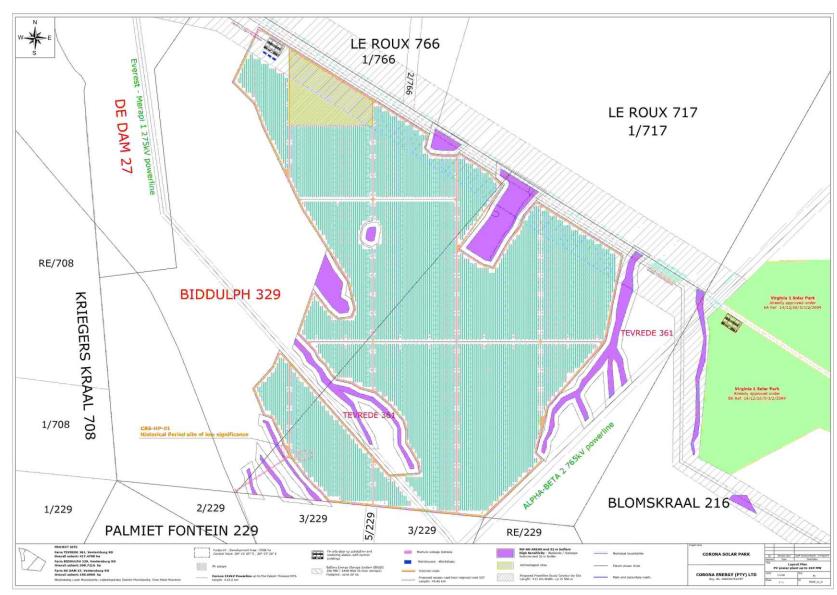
Proposed Layout Plan of the Corona Solar PV facility
